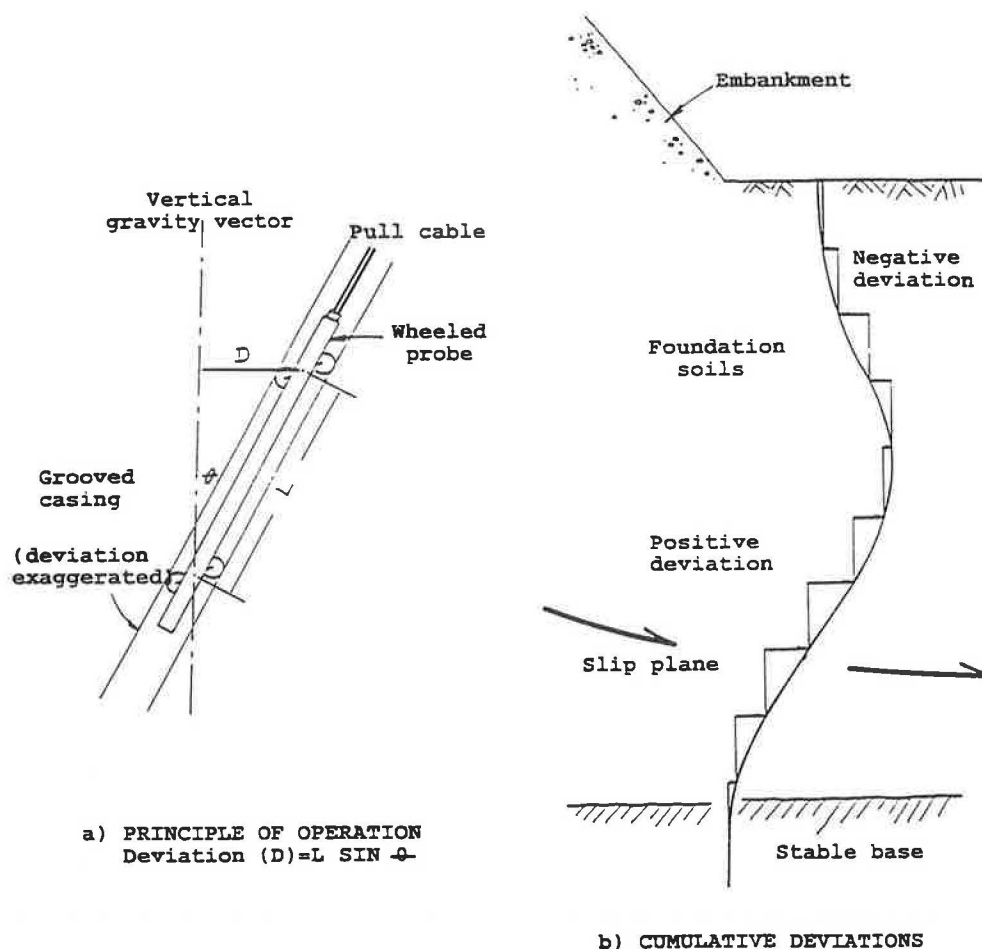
Borehole inclinometer (Courtesy of Geotechnical Instruments, Inc.).
